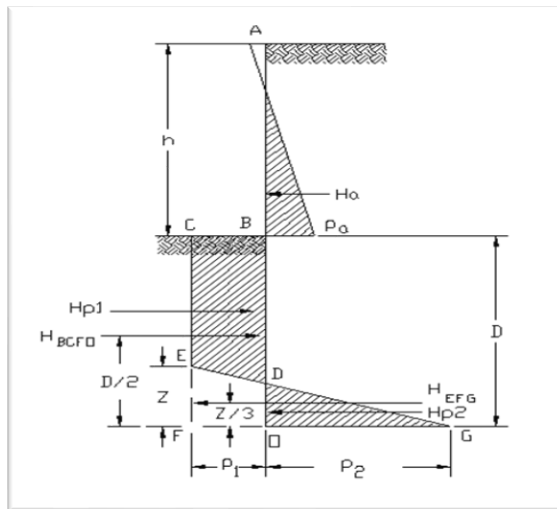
pressure distribution on a cantilever sheet pile in cohesive soils
